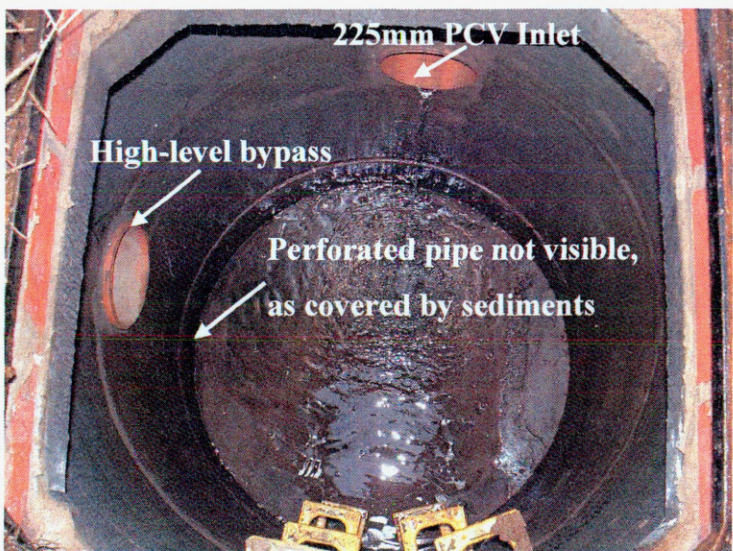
Sedimentation at infiltration trench shown in Figure 4-10.
